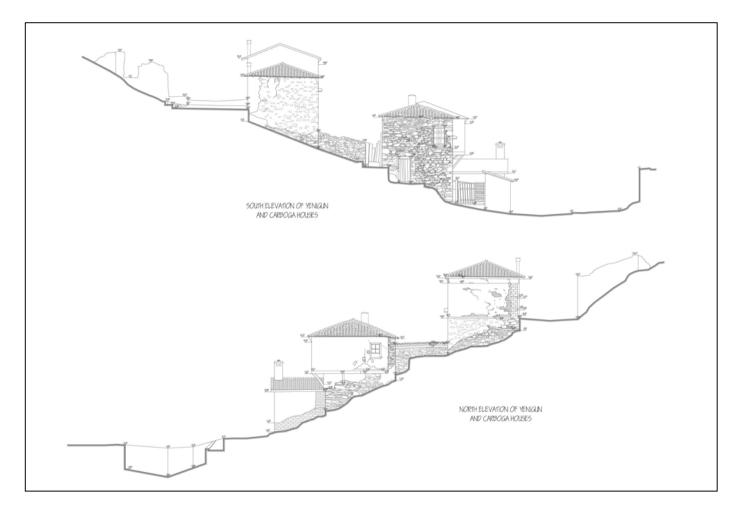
North and South elevations of Yenigün and Çarboğa Houses
